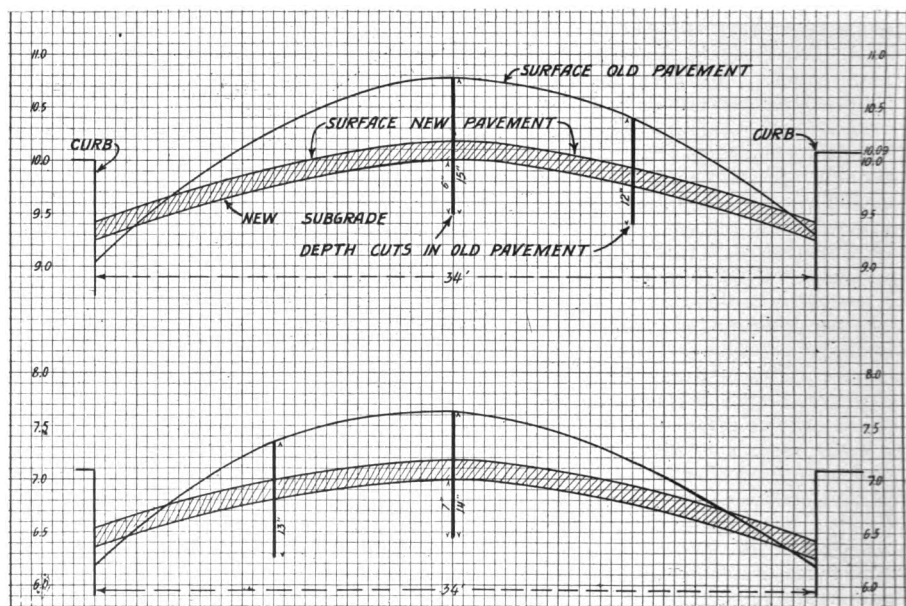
STUDIES MADE OF OLD PAVEMENT TO DETERMINE CROSS SECTION FOR NEW WORK.
